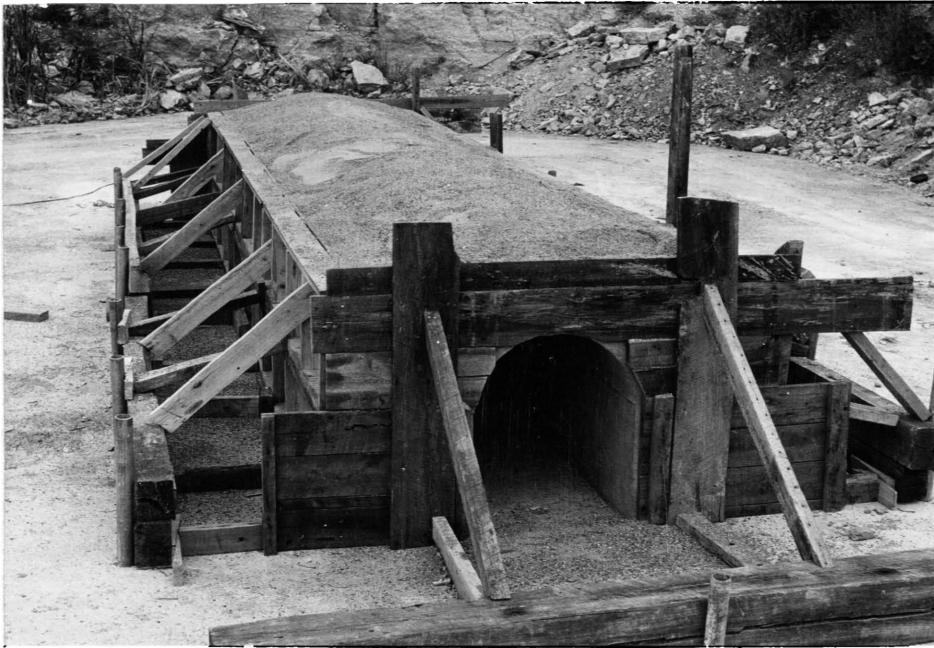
Type A tunnel constructed for Test Six "A", Phase II.
